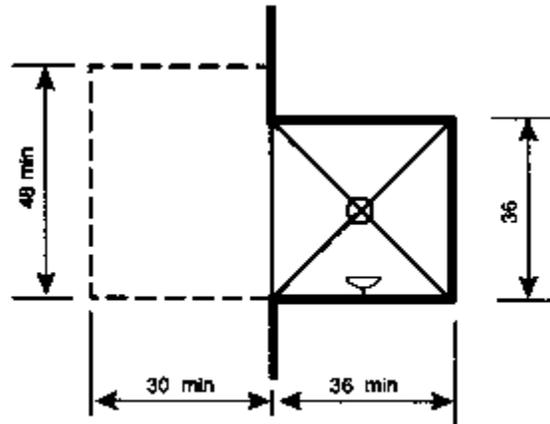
Clear Floor Space for Adaptable Bathrooms
